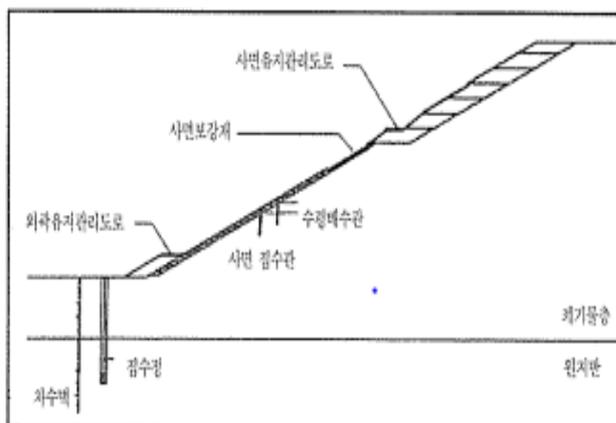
Design concept of slop stabilizing facility for Nanjido Landfill Stabilization
